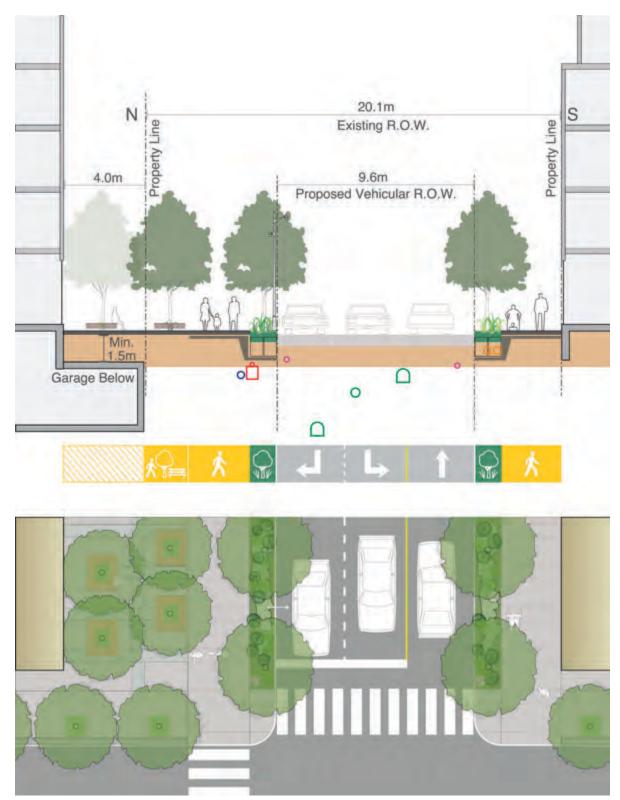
Section and Plan of Merton Street Promenade - Recommended Final Condition at intersection with Yonge Street
